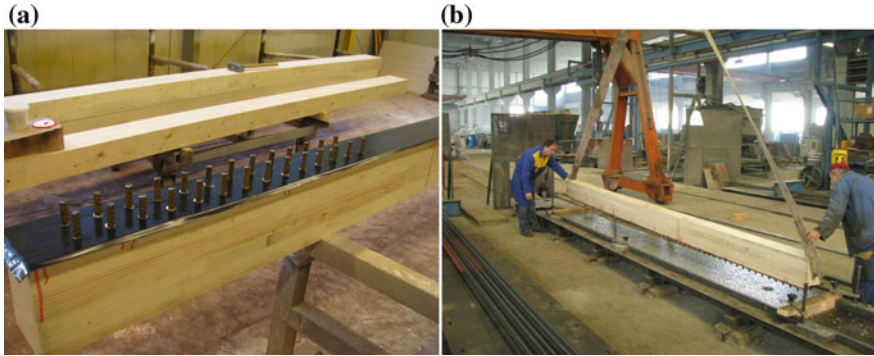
a Installation of the steel dowels onto the timber beam and b laying of the timber beam onto the concrete slab [70]
